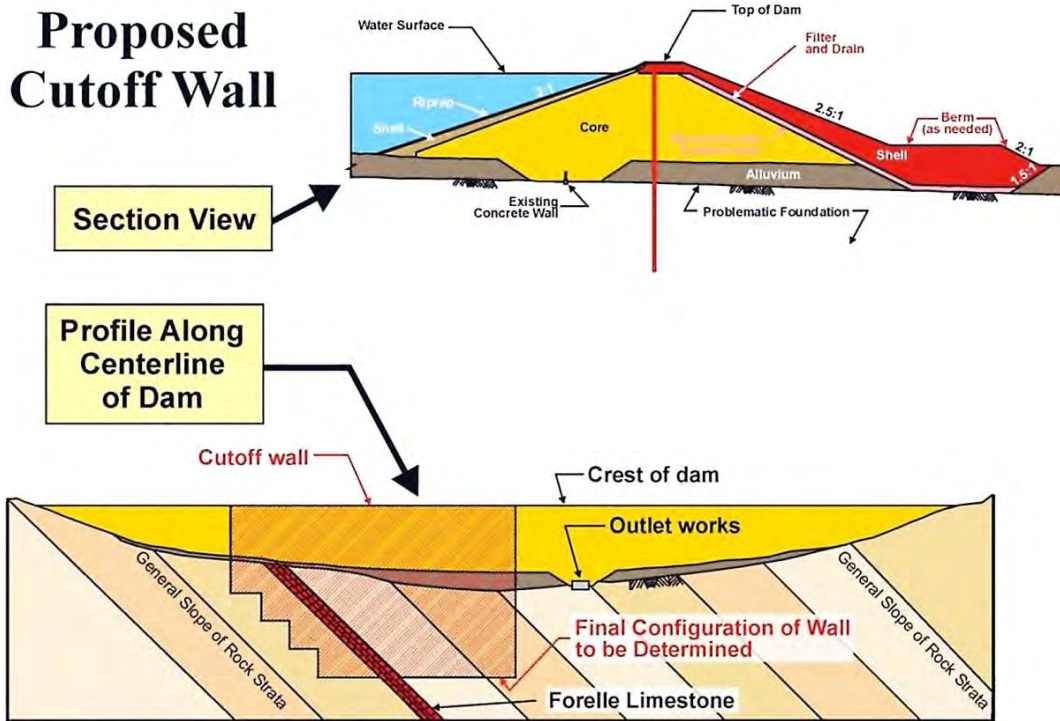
Proposed cutoff wall location at Horsetooth Dam.
